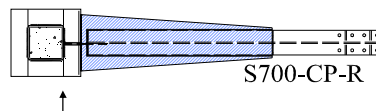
Joint with full length discontinuity of weld between plates of the external diaphragm (un-penetrated weld root)
